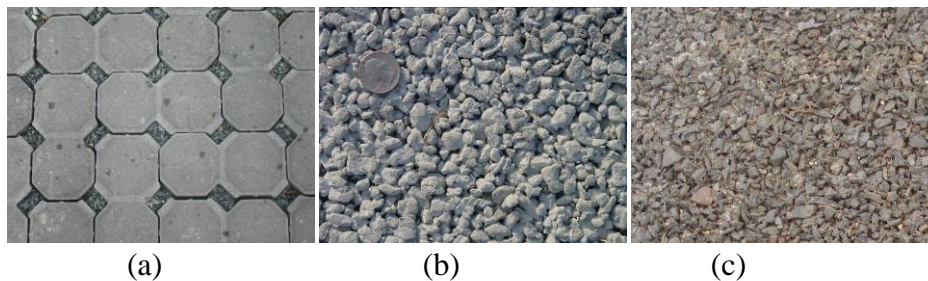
Common Pervious Pavement Materials: a) Permeable Interlocking Concrete Pavers, (b) Porous Concrete, (c) Flexi-pave™
